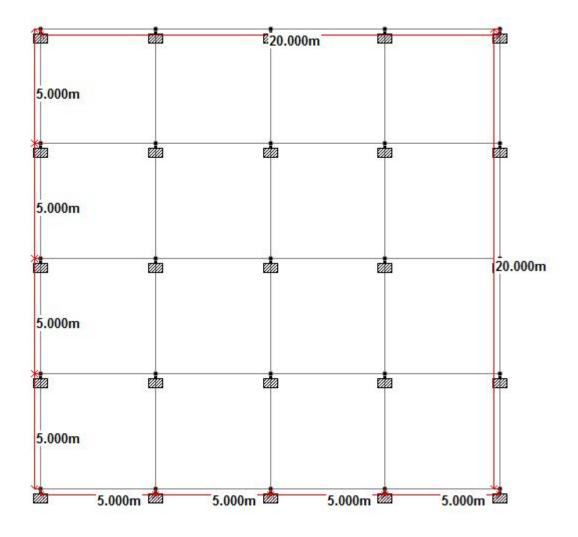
Structural Floor Plan Of Steel Concentric Frame
